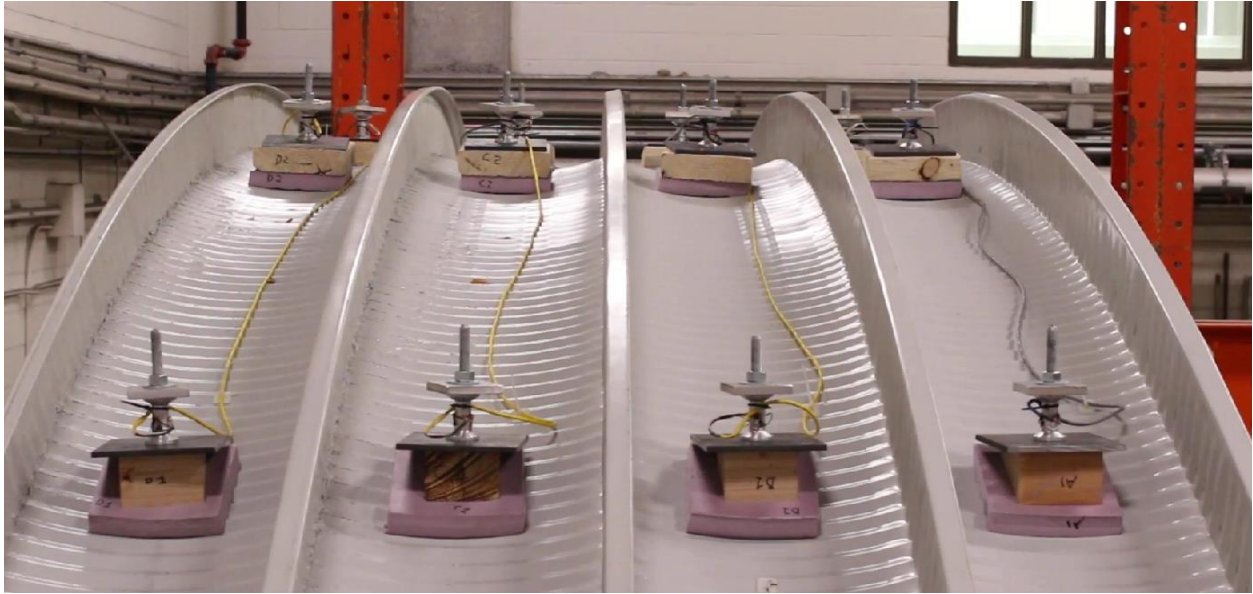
Balanced Loading & Fixed Support Specimen Top View
